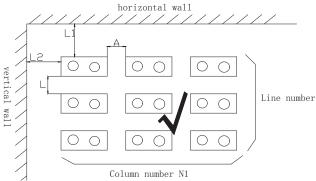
With the horizontal and vertical walls $(\sqrt{})$
